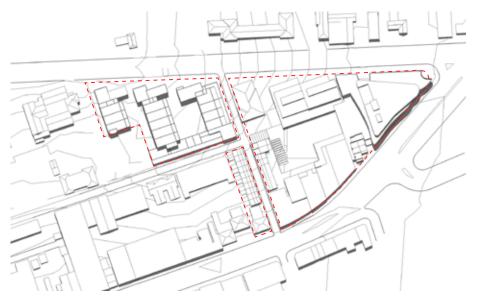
Exhibited Concept Plan: 12 Noon
